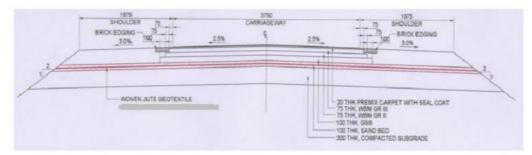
cross-sectional details of pavement with jute geotextile
